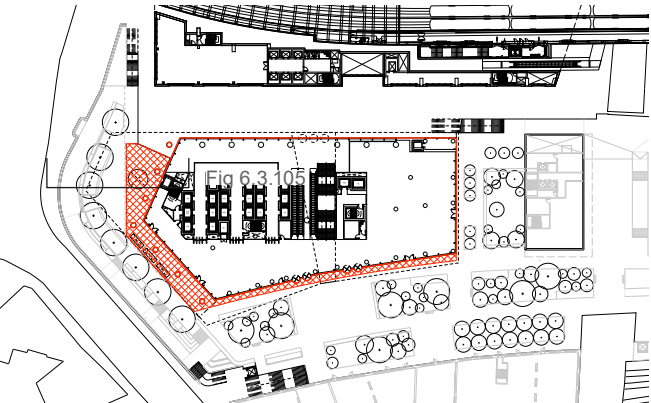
Plan showing the proposed new lid structure [red hatch]
